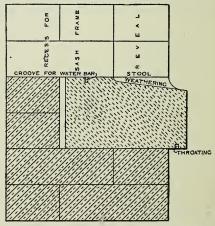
Section of Window Sill fixed in 14-in. Wall.
